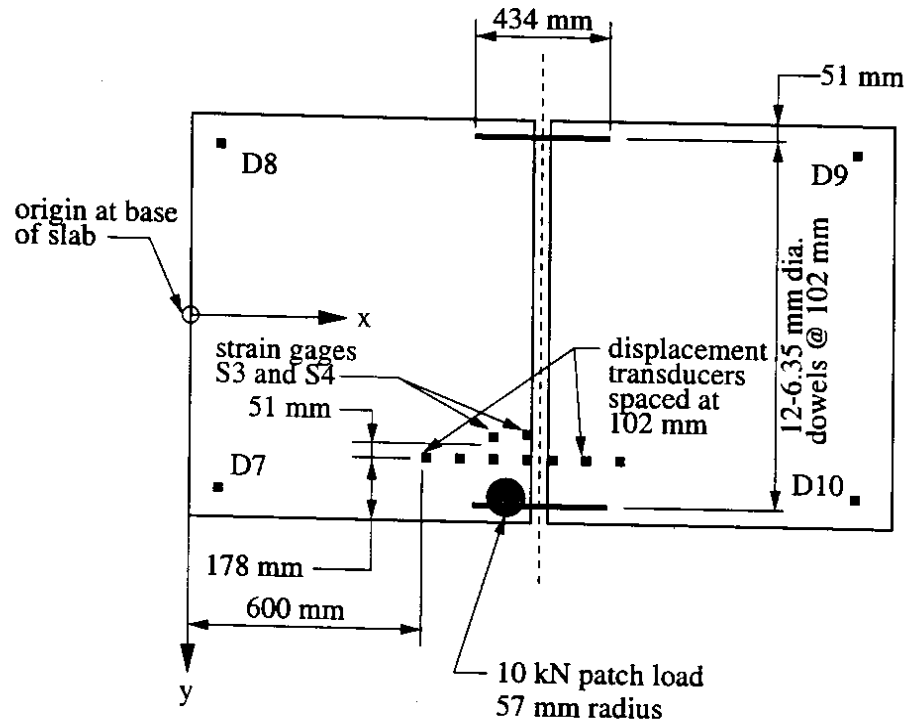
Dowel Locations, Loading, and Instrumentation [33]
